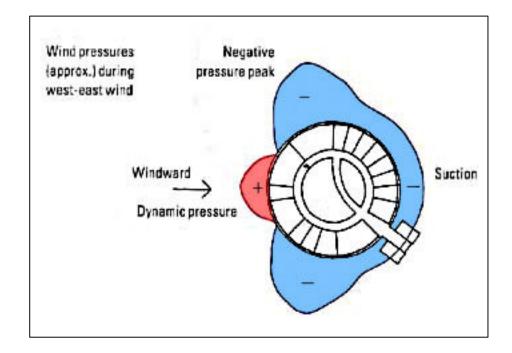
RWE Headquarters Tower – air pressure differences around the building (base drawings: Ingenhoven Architects)
